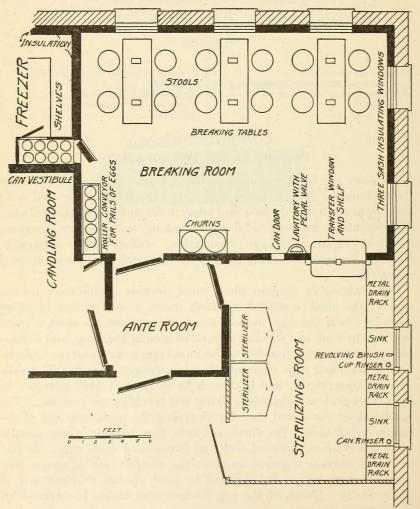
Typical layout of breaking and sterilizing rooms.
